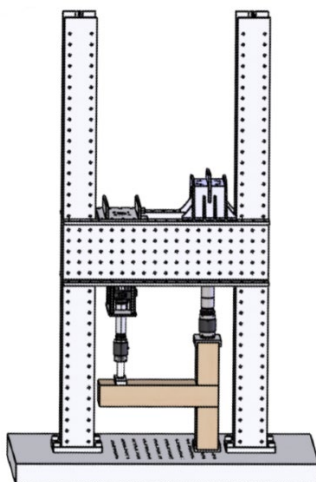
Test setup for the wall-floor-wall connection in the steel load frame.
